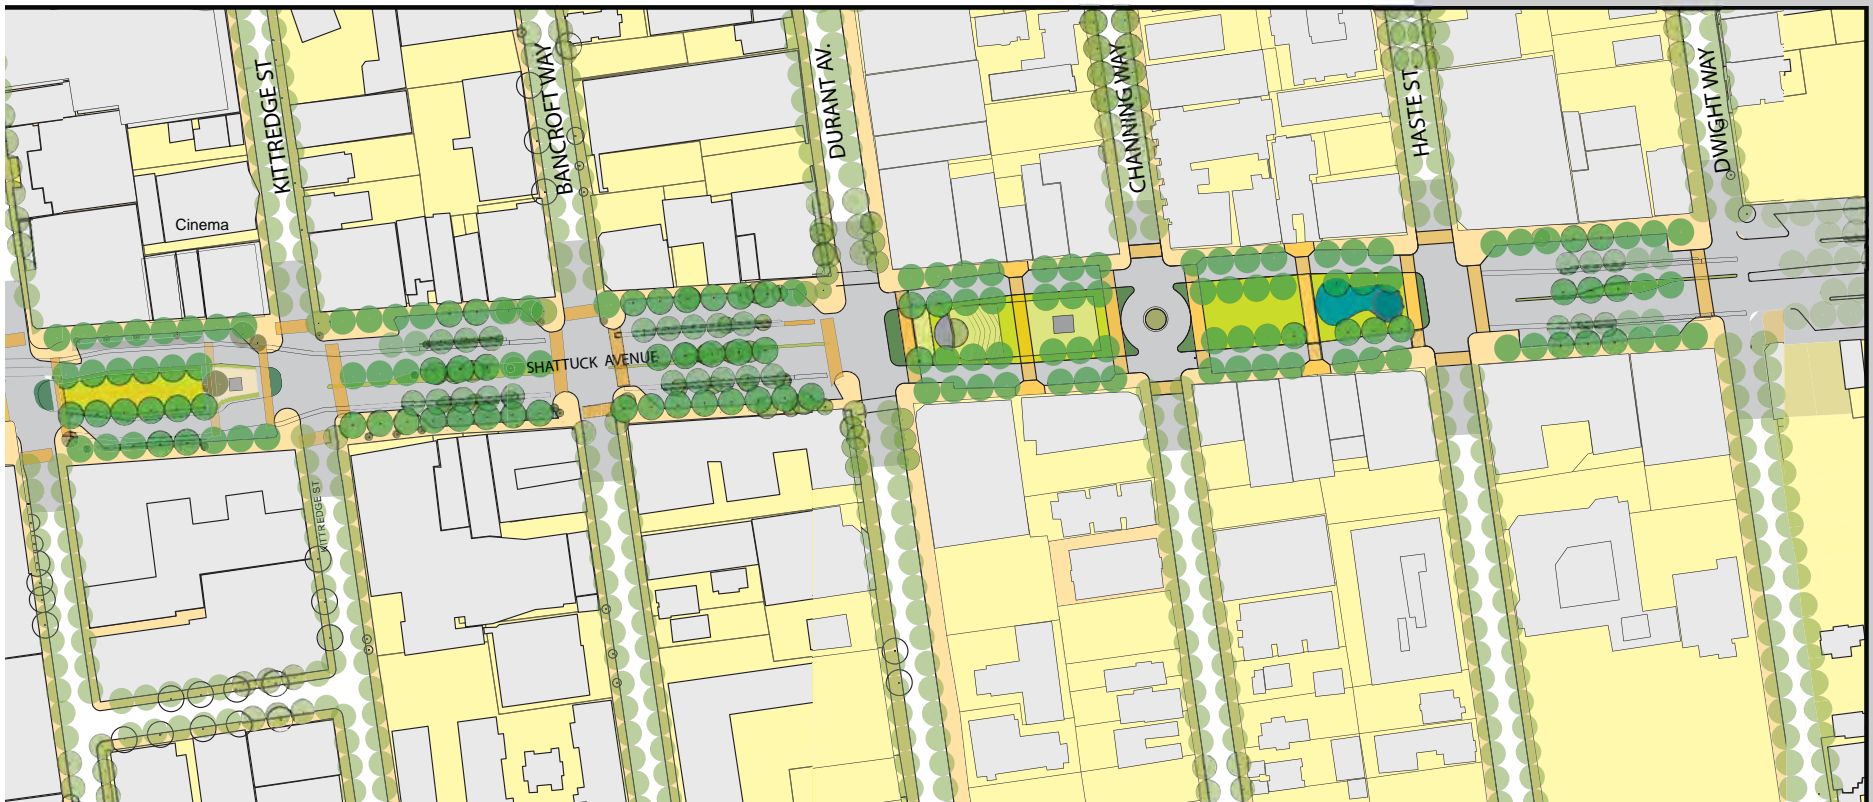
Shattuck Avenue South of Allston Improvements: Allston-Kit-tredge Park Block, Lower Shattuck Park Blocks, with sidewalk widenings along other street segments. Bike lanes would run continuously south of Allston.
